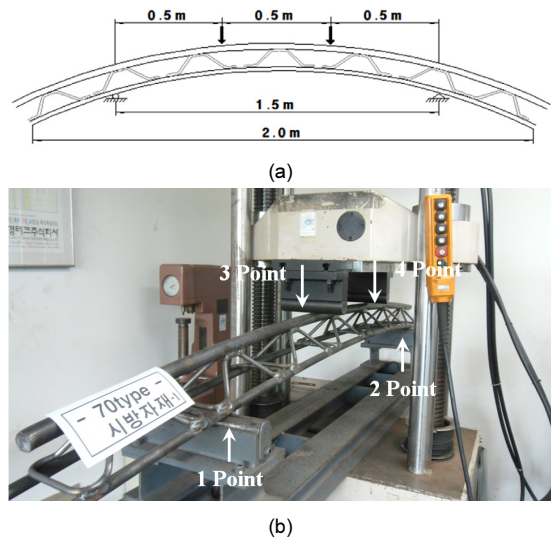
Bending test sample and loading location : (a) Bending test specimen and loading location; (b) The test for bending
